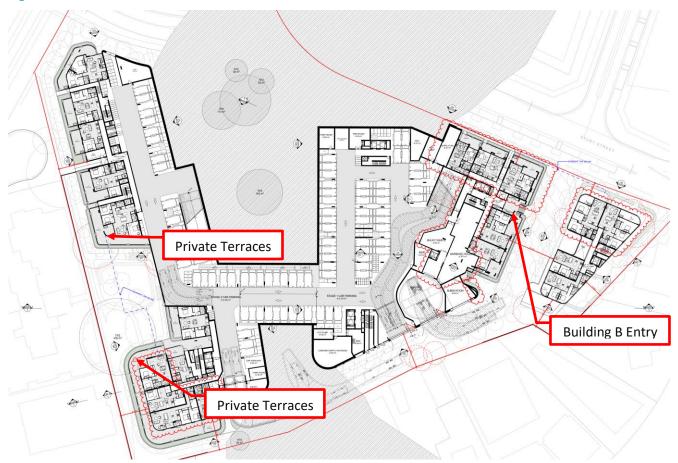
Areas of Interest Upper Ground Level Ground Level Open New North Street Ground Level Sturt Street Pedestrian Areas Pedestrian Pathway Communal Open Pathway Space Winter Street Pedestrian Private Terraces Building E Entry Building B Entry Private Road Building D Entry Through Building Building C Entry Links
